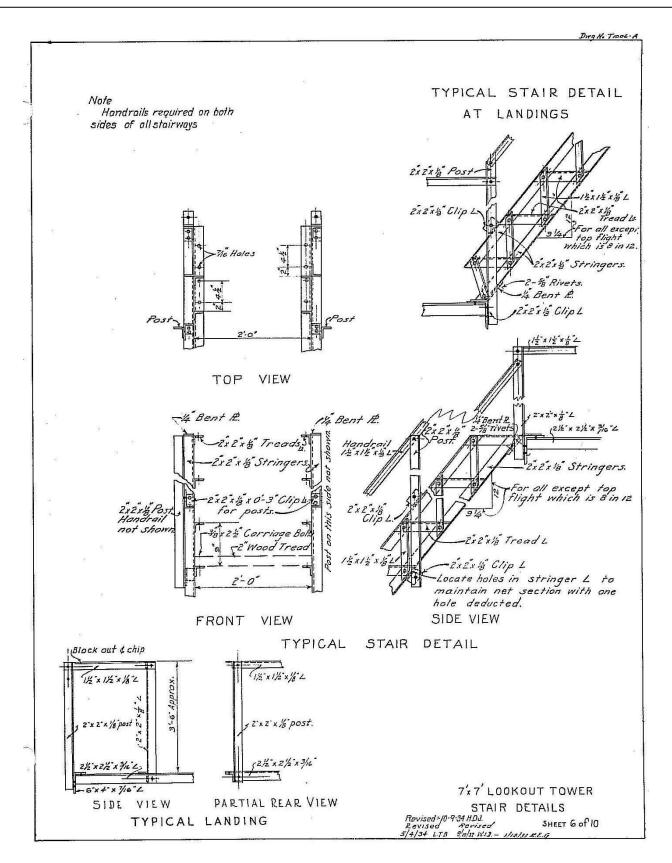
USFS specifications for steel fire lookout tower stairs (Fickes, 1935: 303).
